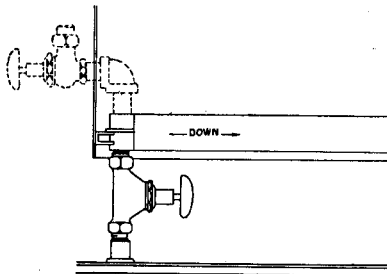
Using Non-offset Straightway Valve for Up-feed supply with Alternate Down-feed connections using Angle Valve.
